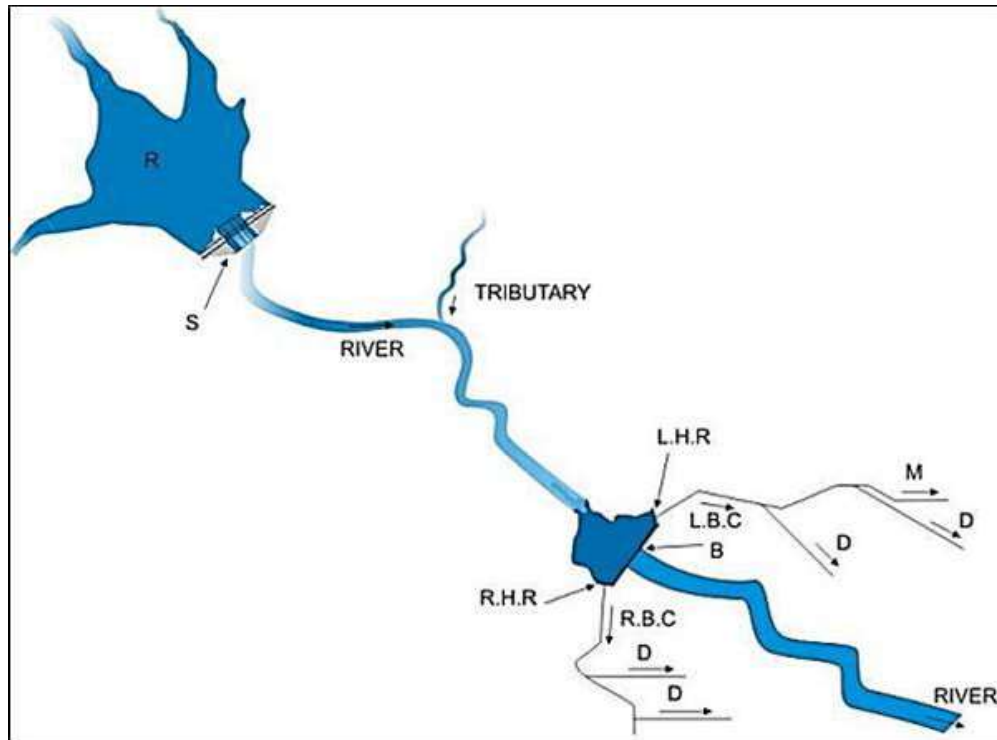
A typical layout of a storage irrigation scheme incorporating a dam with a barrage on its downstream
